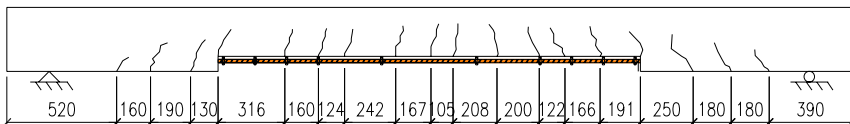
Crack pattern of beam where cover concrete was removed after failure load test.
